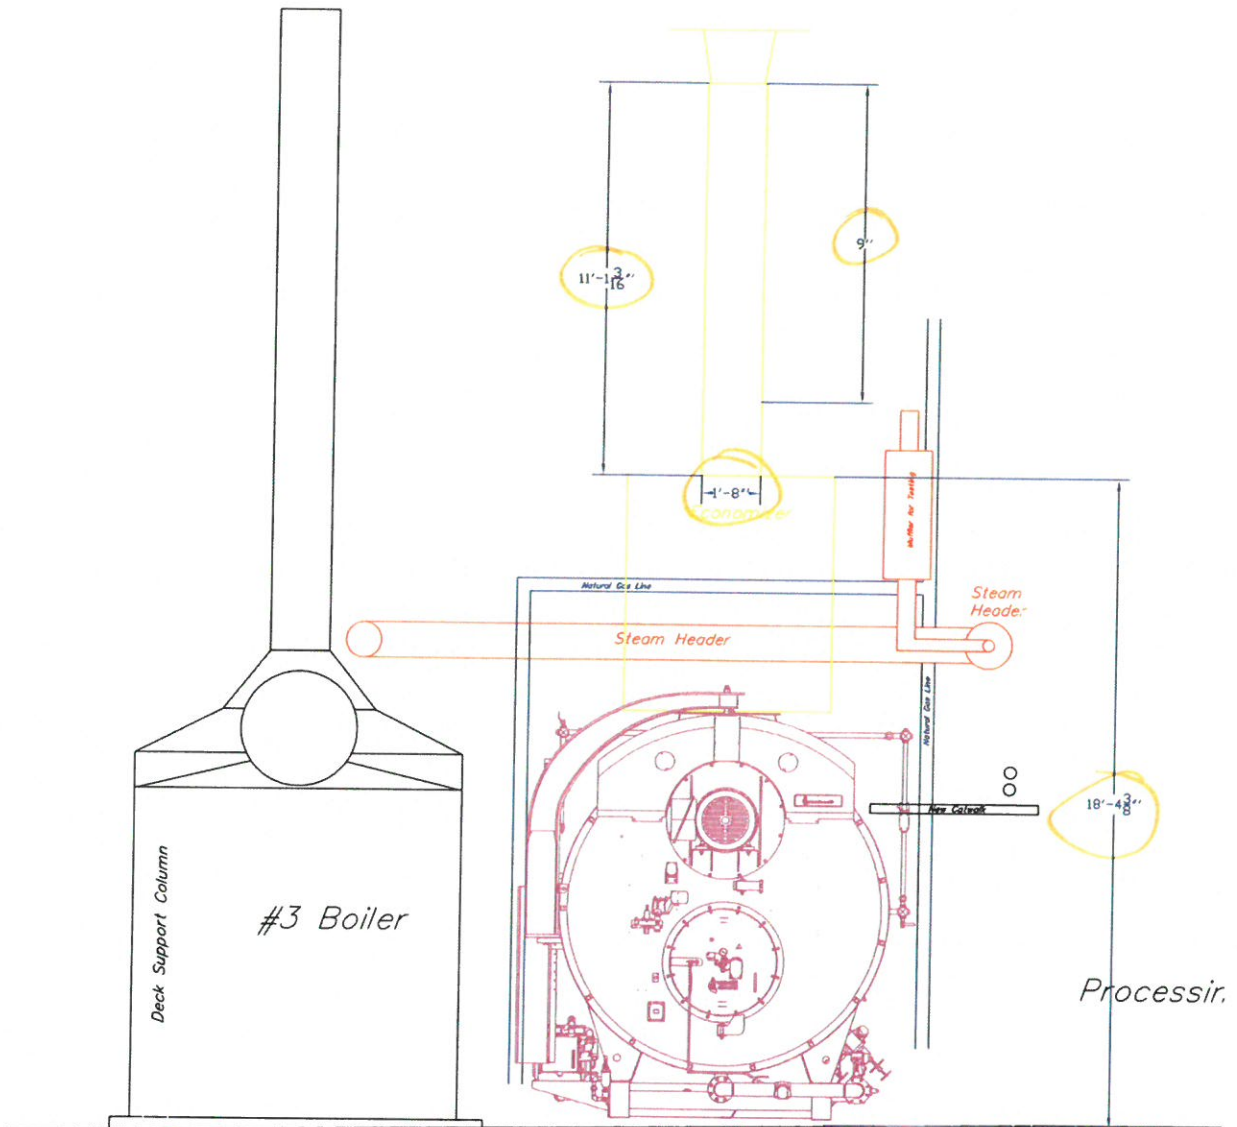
The drawing of a new 1000 Hp boiler and Boiler #3
